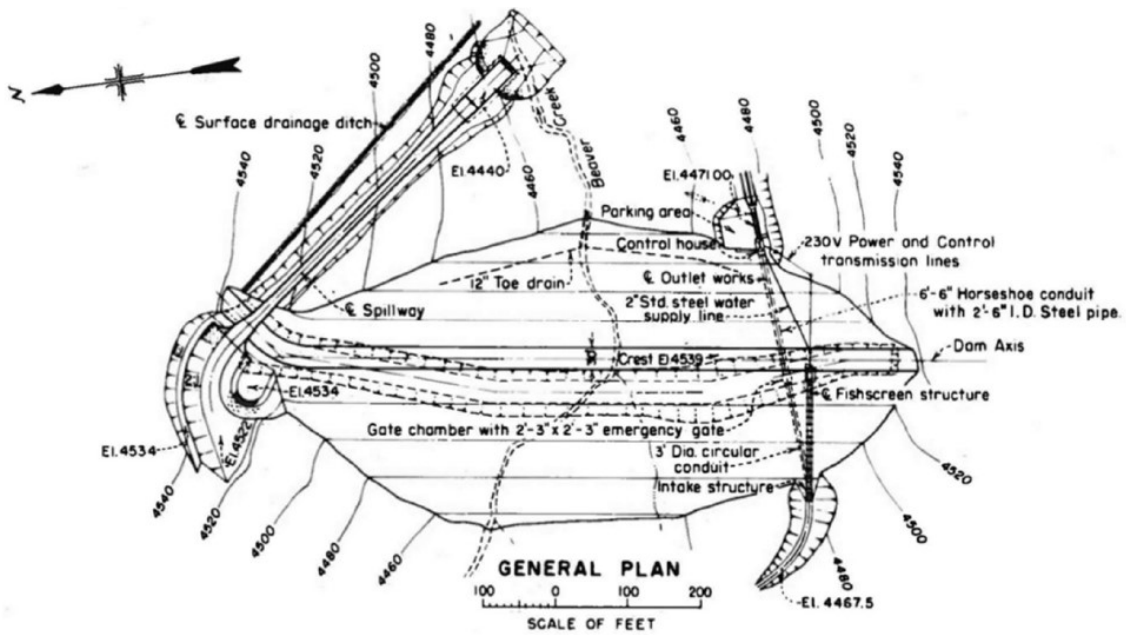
Plan view diagram for Howard Prairie Dam (as built).
